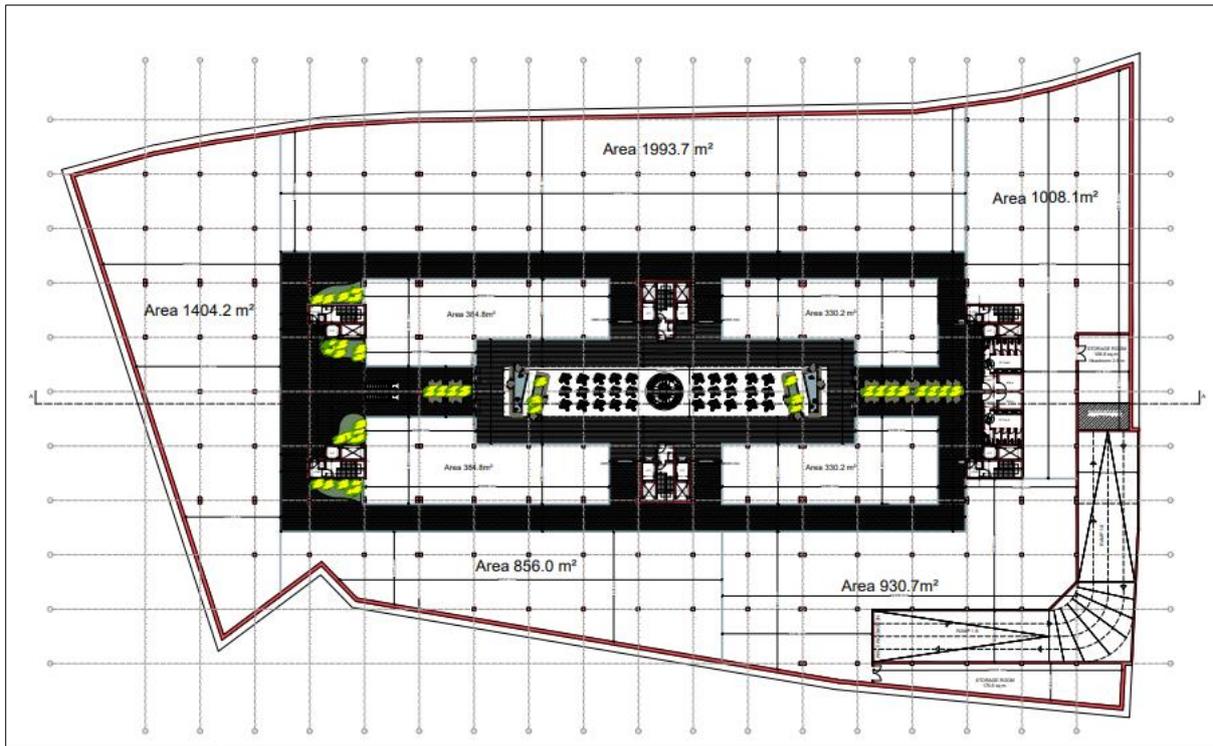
Proposed shopping mall at level -1 (Source: PA/02454/19 – 1j)
